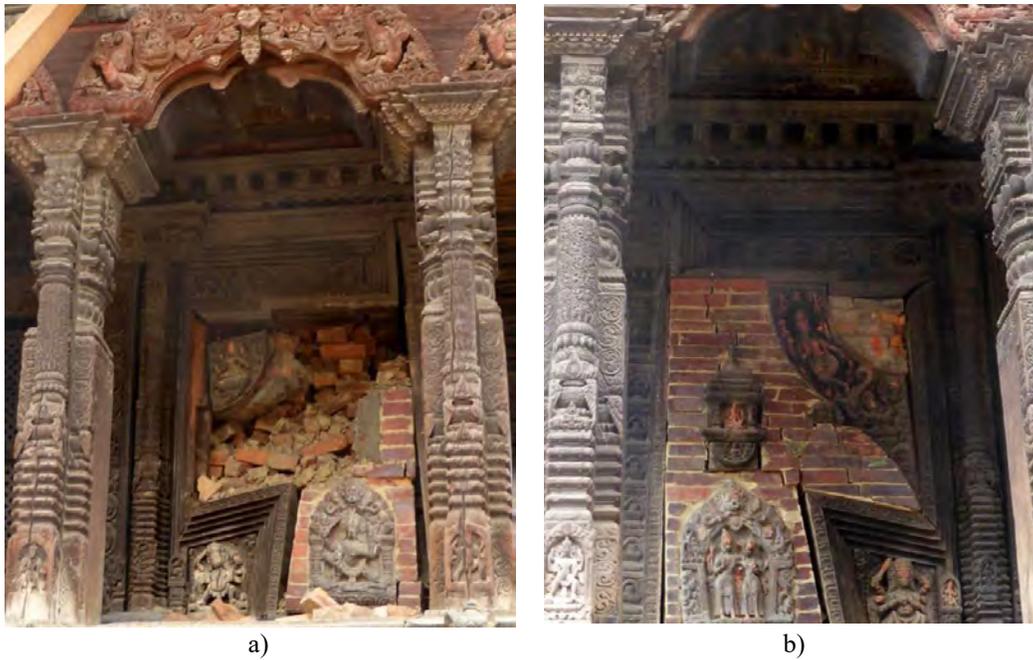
Damage of Vishwanath temple, Patan: a) a damaged panel showing dislocation and falling off of masonry and b) another panel that suffered minor damage—note timber bracing (S. Brzev).
